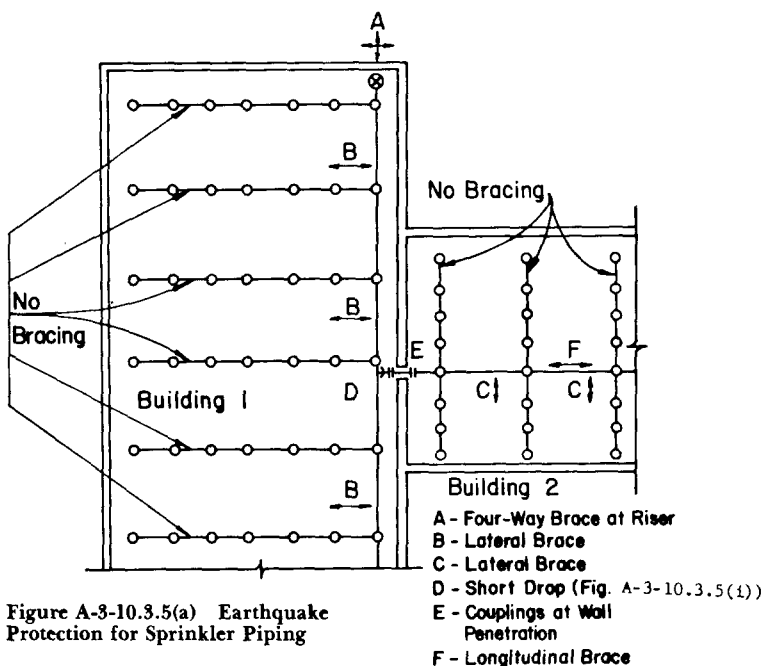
(a) Earthquake Protection for Sprinkler Piping
